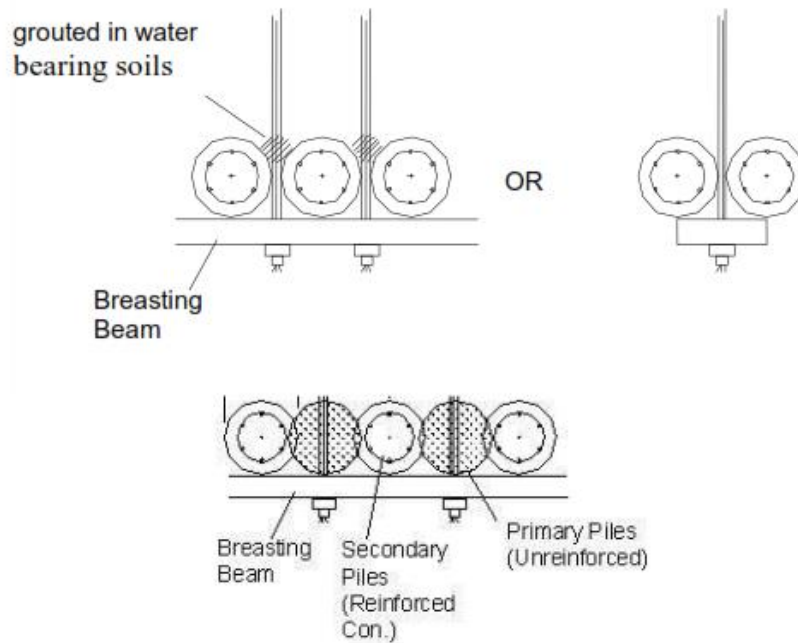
Types of Pile Wall (Ergun, 2008)
